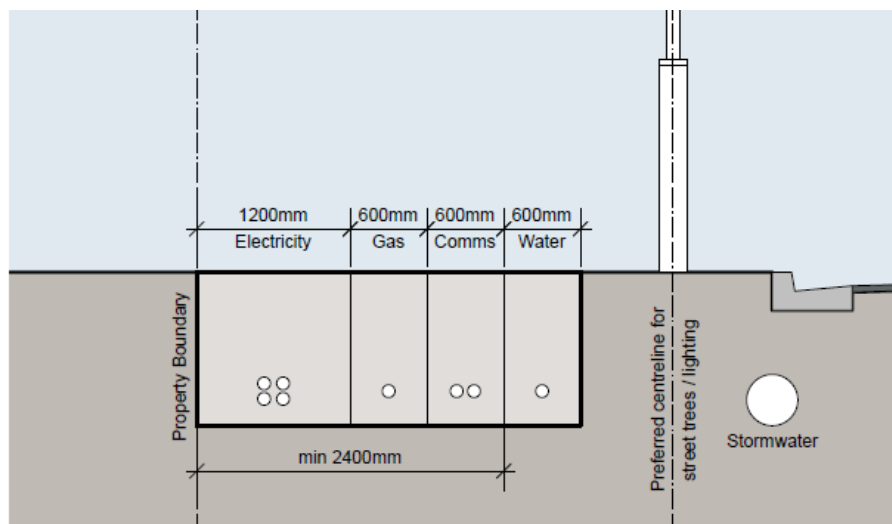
Underground Service Allocation (verge width 3-3.6m)
